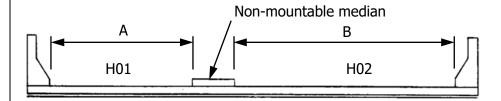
Cross-section view of two highway features carried on the bridge with a non-mountable median.
